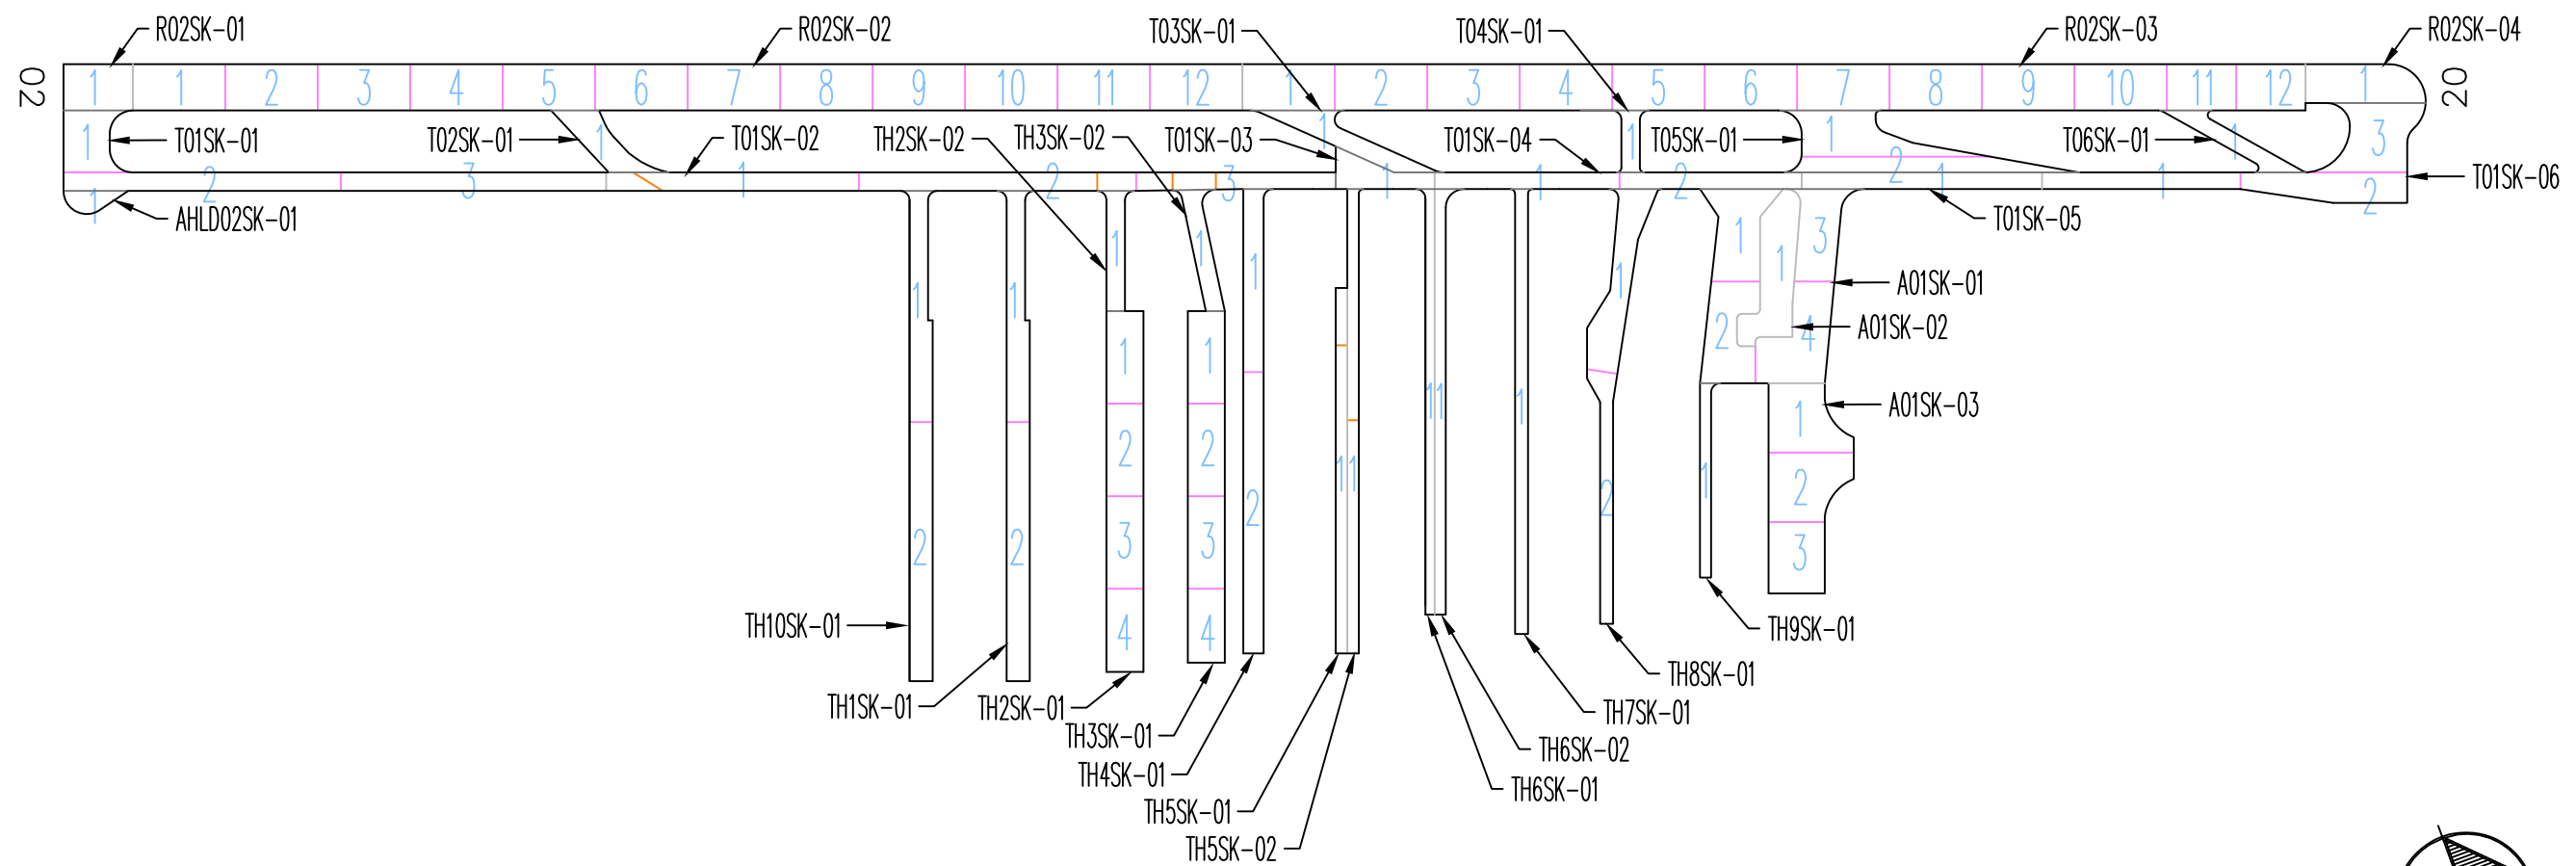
Pavement Branch, Section and Sample Unit Layout.
